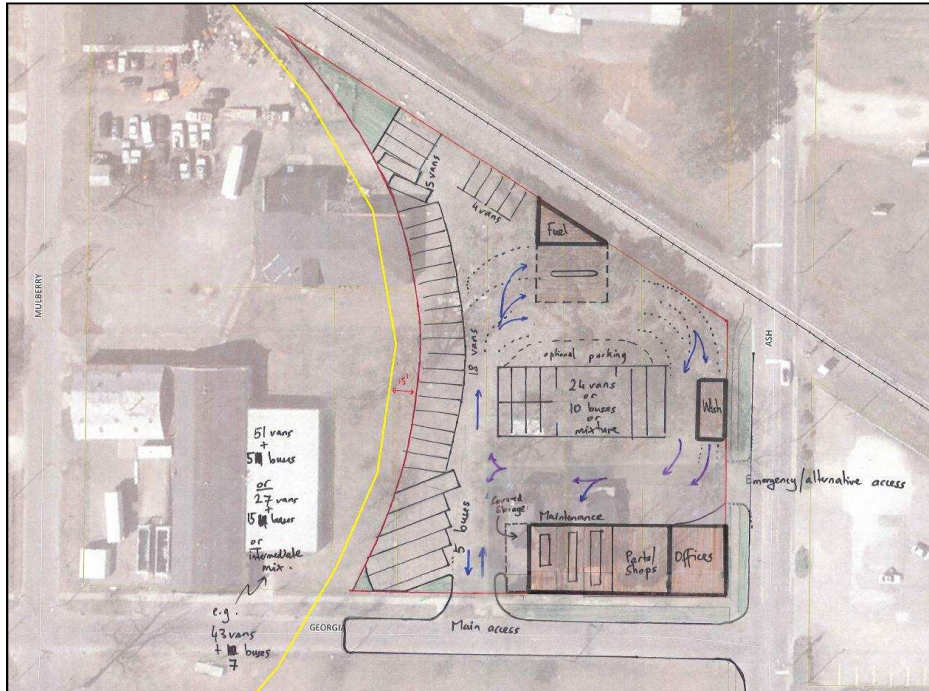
Georgia Avenue Site – Railroad Proposals
